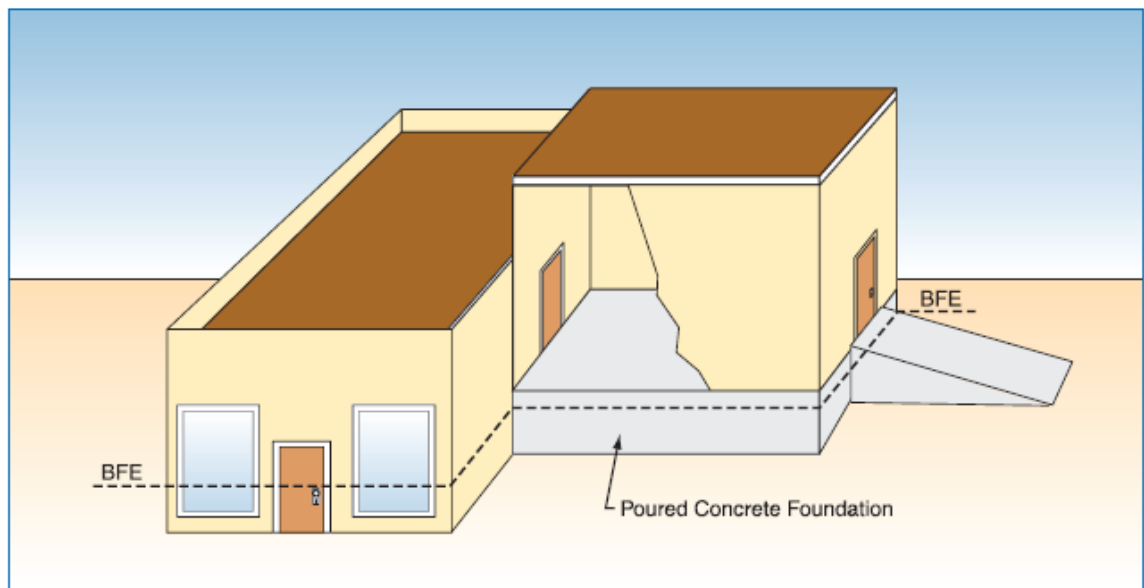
Lateral addition to a non-residential building in an A zone – the proposed work is only the addition (no work on the existing building and no structural modification of the common wall or roof). The work constitutes substantial improvement. The addition is elevated to or above the BFE (an alternative would be to dry floodproof only the addition, including the common wall).
